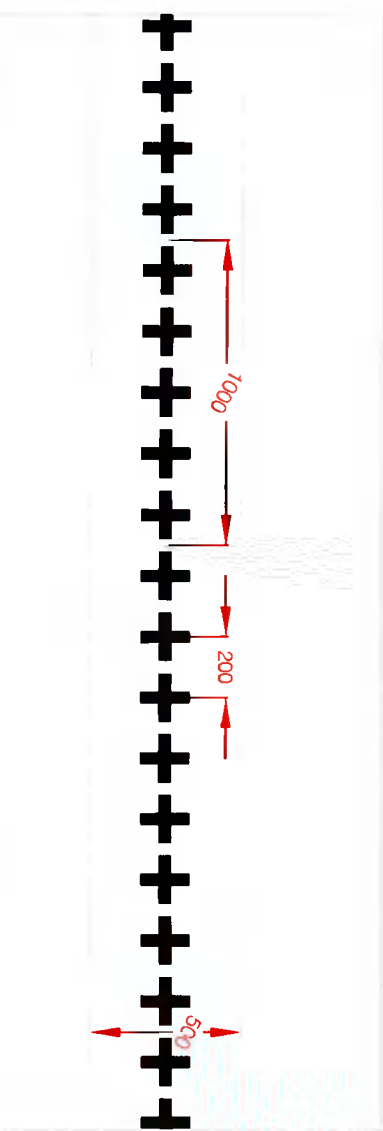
HEDGE PLANTING DETAIL (3no. per lin.m)
